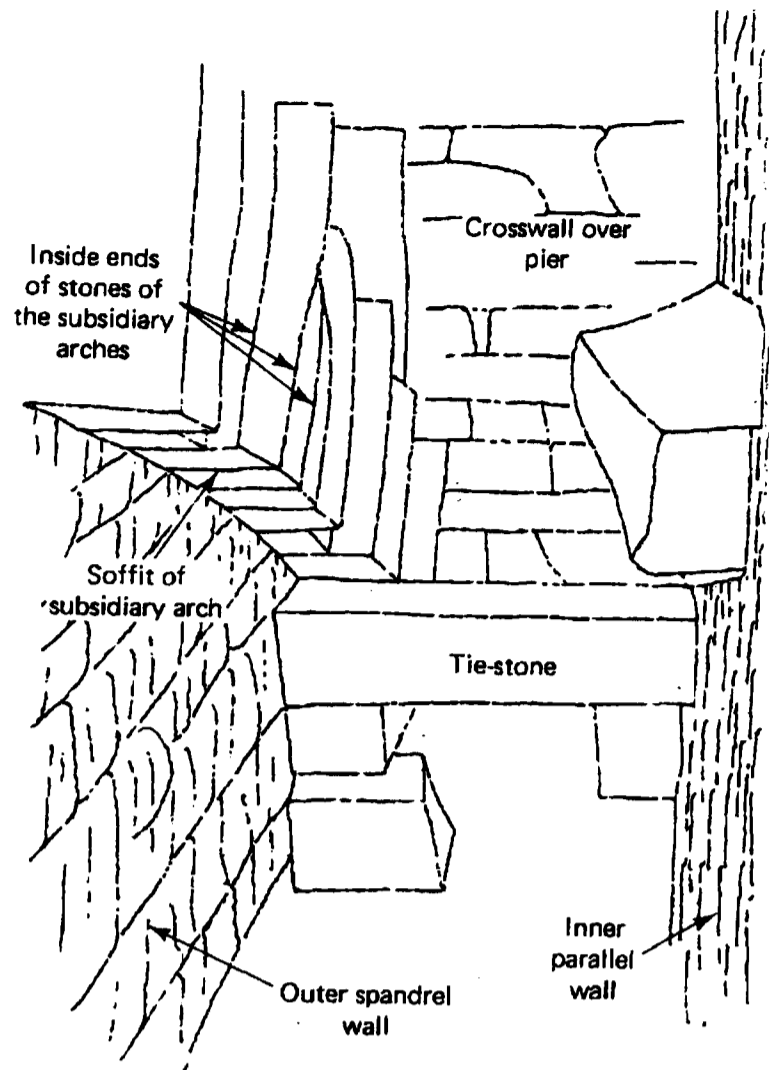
Interior of spandrel of Dean Bridge (after Ruddock, 1979).
